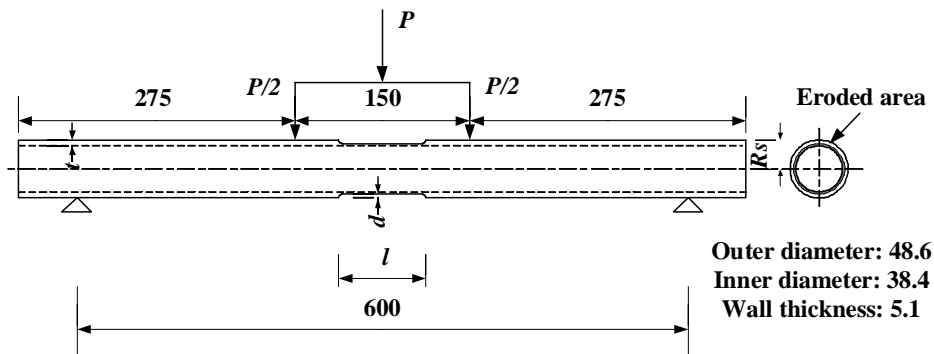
Shape and dimensions of a pipe specimen with circumferentially local wall thinning; dimensions shown in mm.
